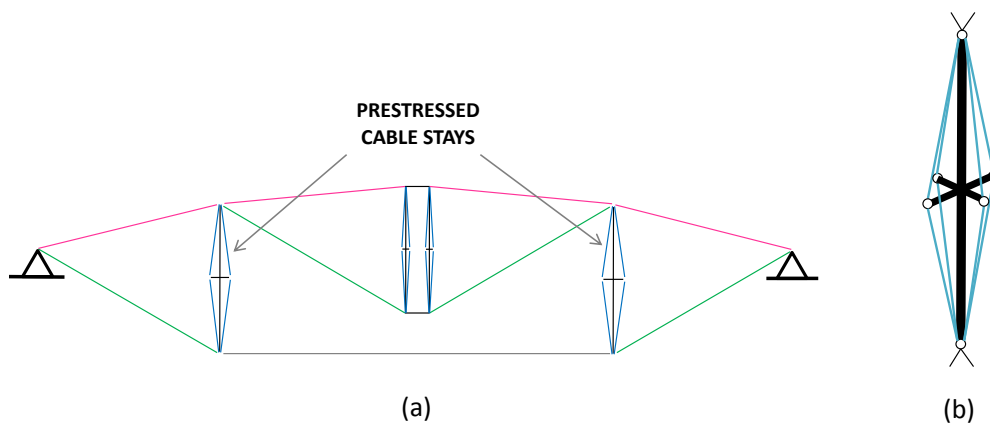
(a) Cable dome with prestressed cable-stayed struts in place of simple HSS struts; and (b) Three-dimensional model of prestressed cable-stayed strut
